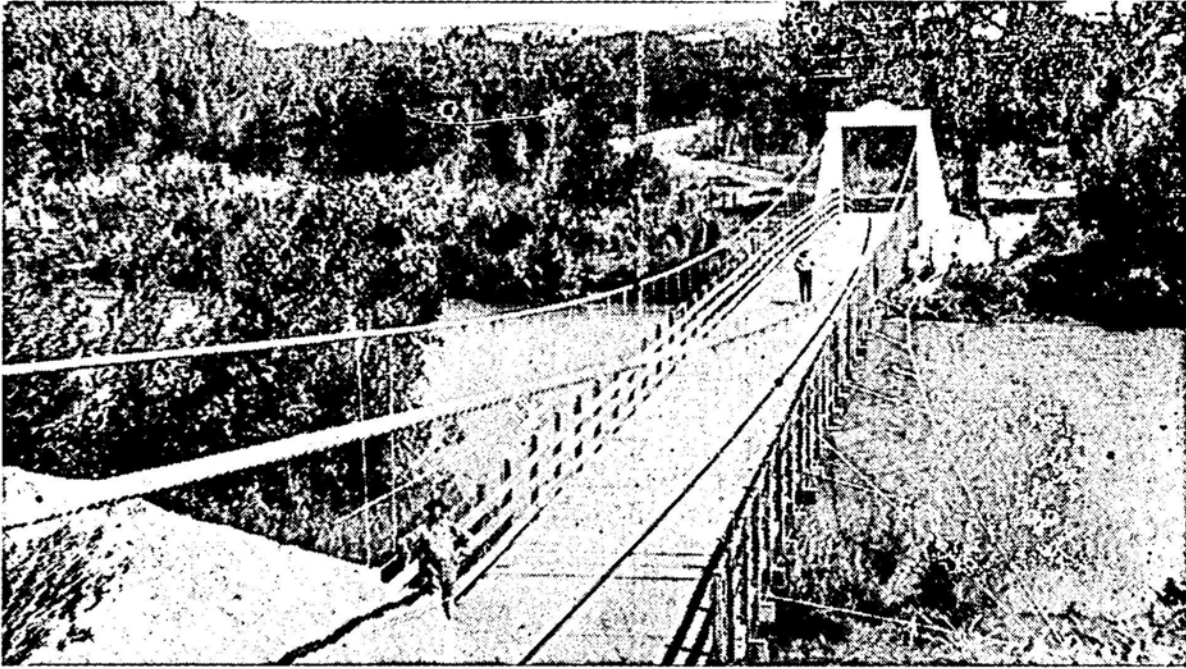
Aztec Suspension Bridge Shortly After Completion in 1908. This bridge was the only structure across the Animas and San Juan Rivers to survive the disastrous flood of 1911. (Photograph Courtesy of the Aztec Museum)
